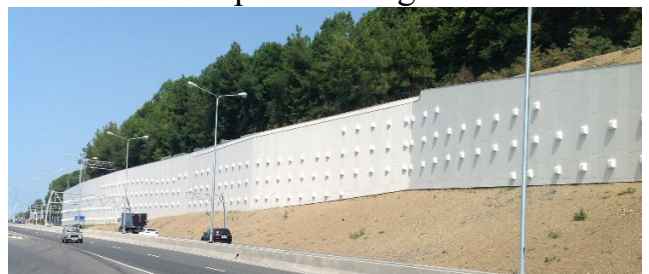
Retaining wall anchored by TITAN anchor piles in Sochi Russia
